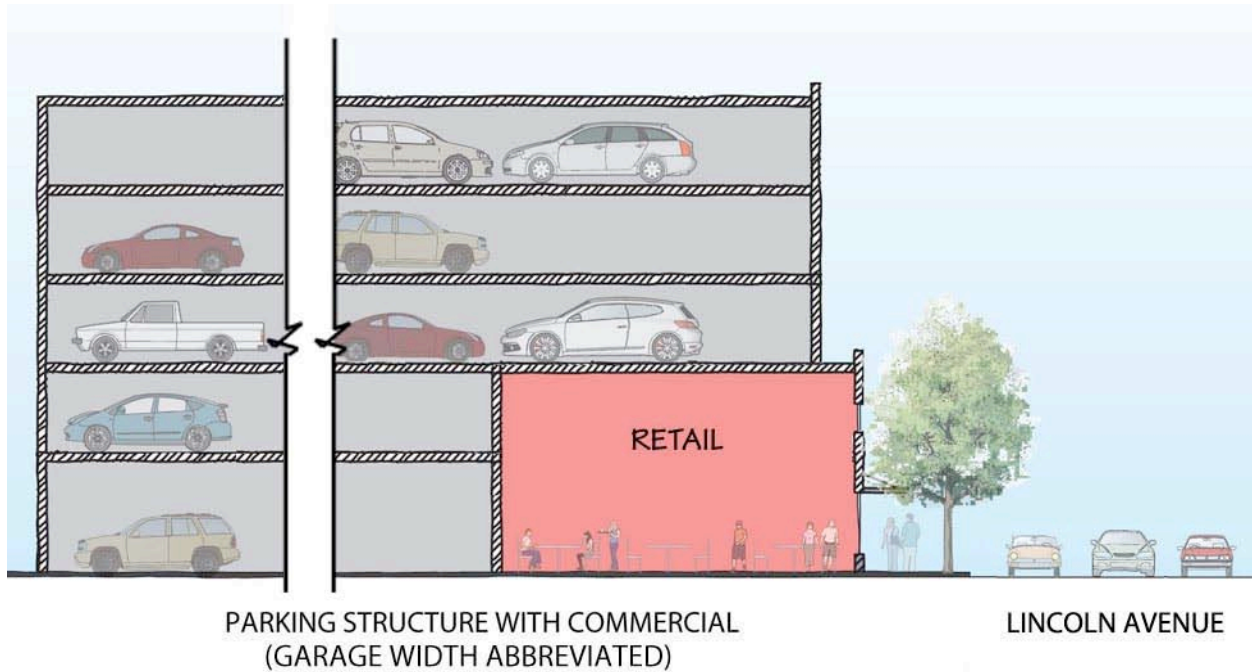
Third and Cijos Street Parking Structure Concept – section looking east
